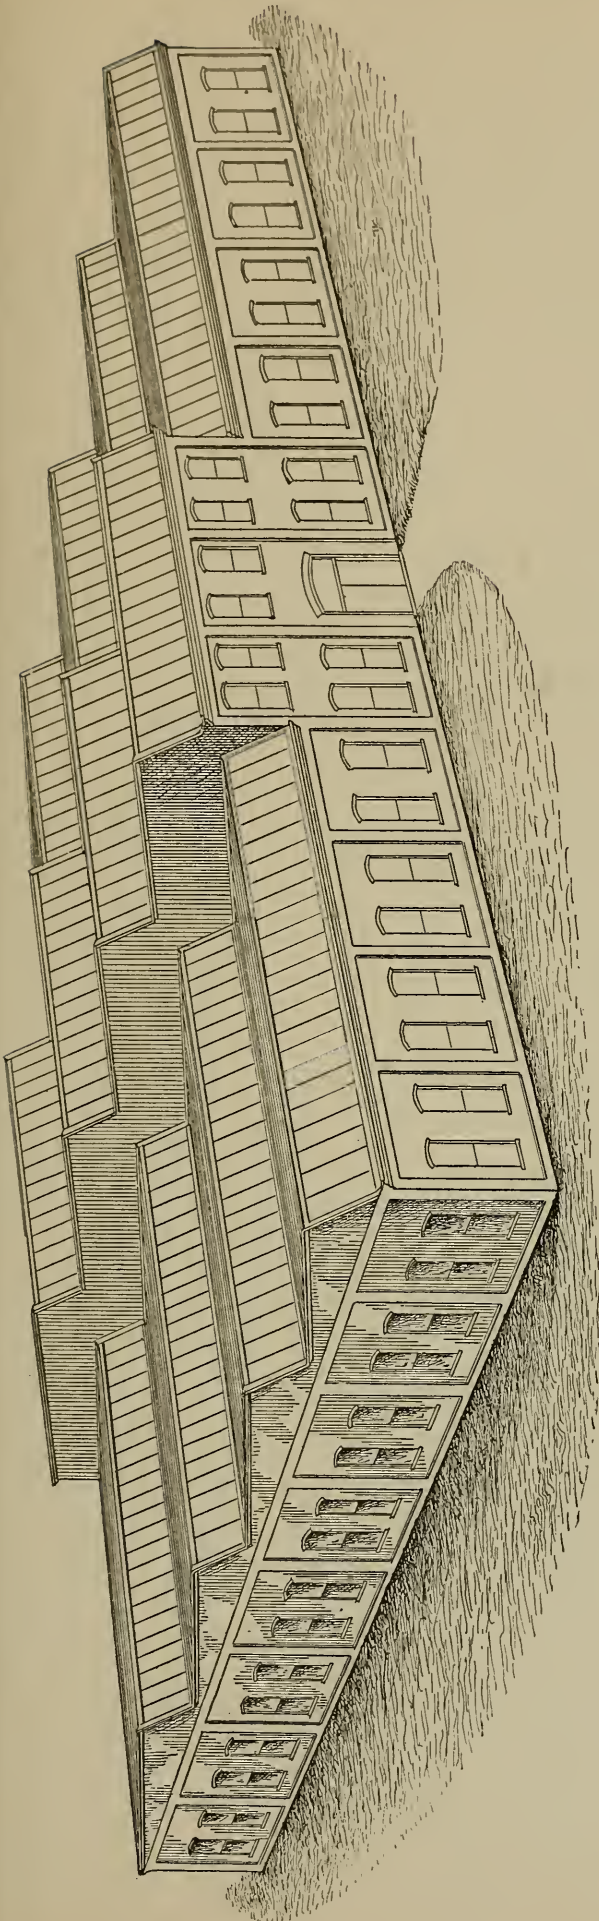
Perspective View of Machine Shop with Saw-tooth Roof.
